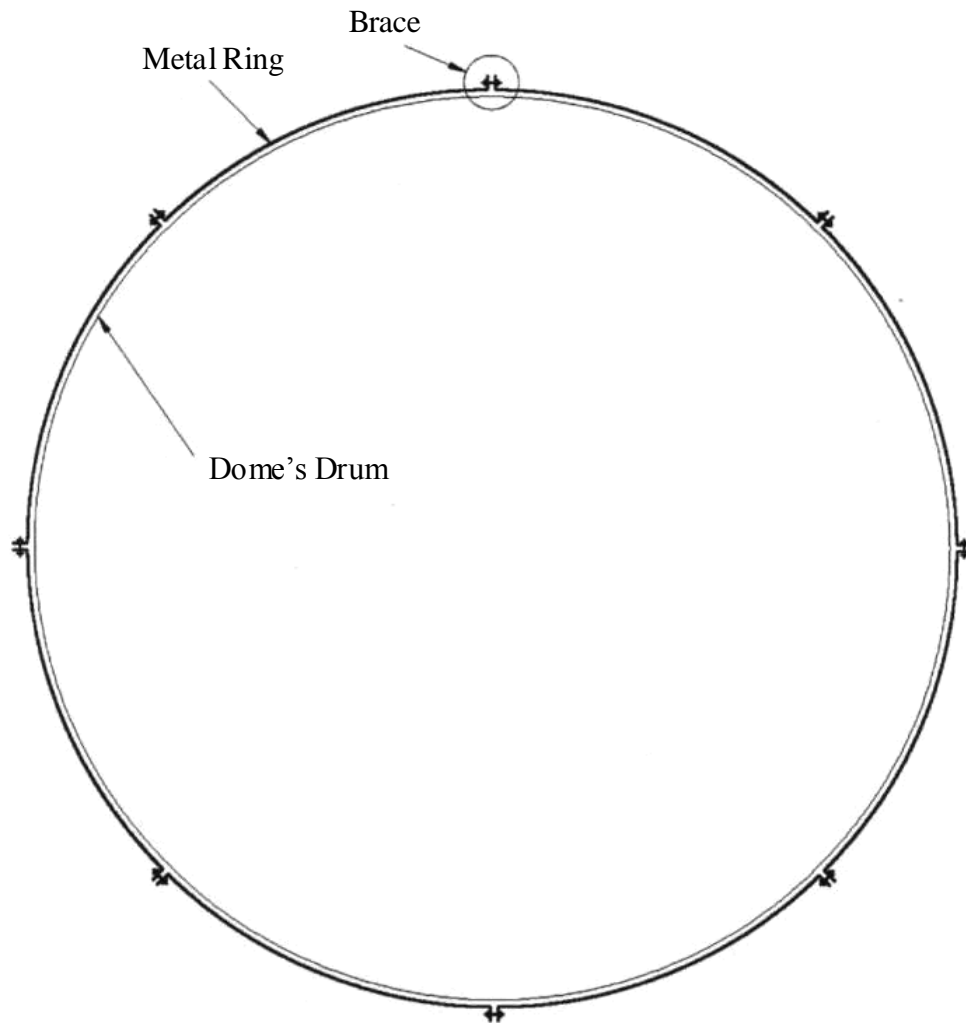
The sketch showing the proposed bracing method (Canbay, 2008)
